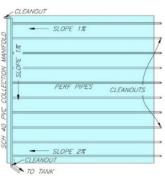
Plan view of the pipe drainage system beneath the wood chip pad.
